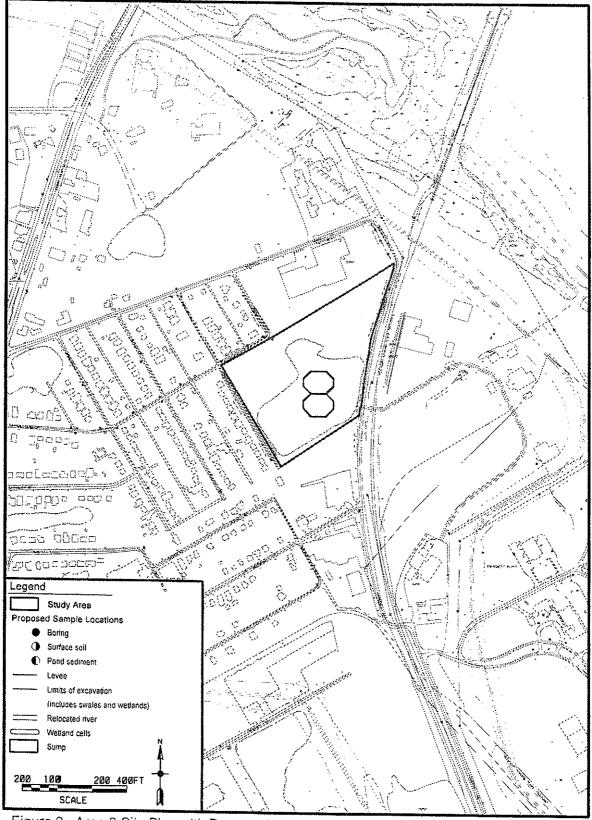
Area 8 Site Plan with Proposed Sampling Locations and Construction Elements.
